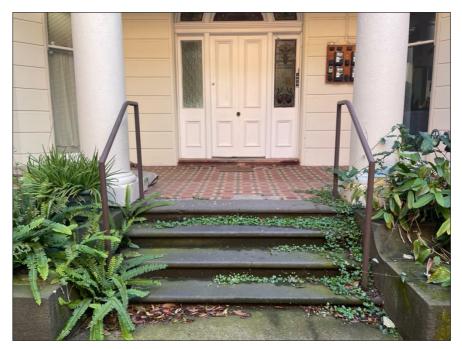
Front steps to the former mansion. The steps may be early or original fabric, with non-original handrails.
